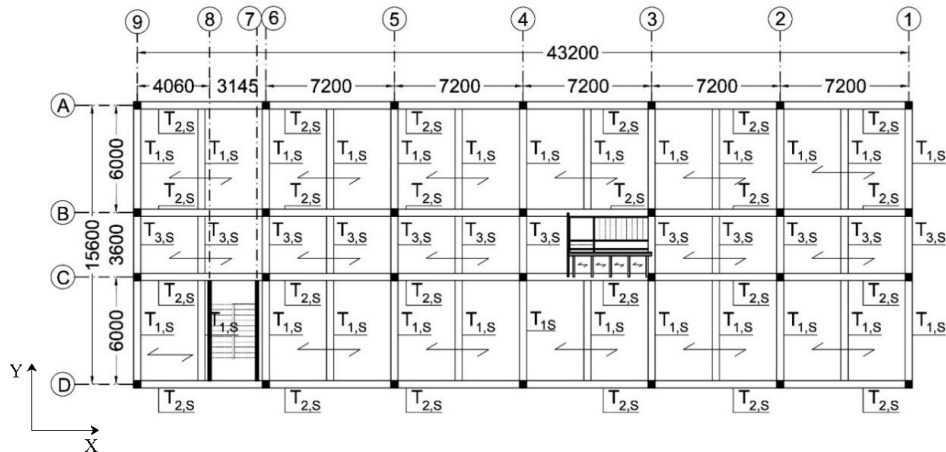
Second floor plan with alphanumeric alignment identification and steel beam numbering.
